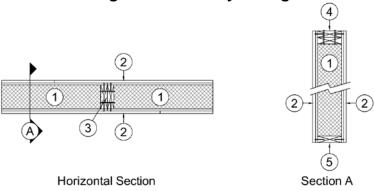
ASSEMBLY DRAWING FOR FIRE RESISTANCE
